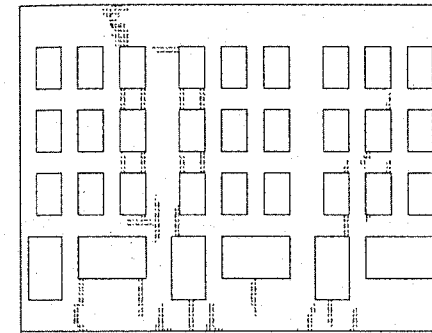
Final fully open cracks in Wall A with creep process.
